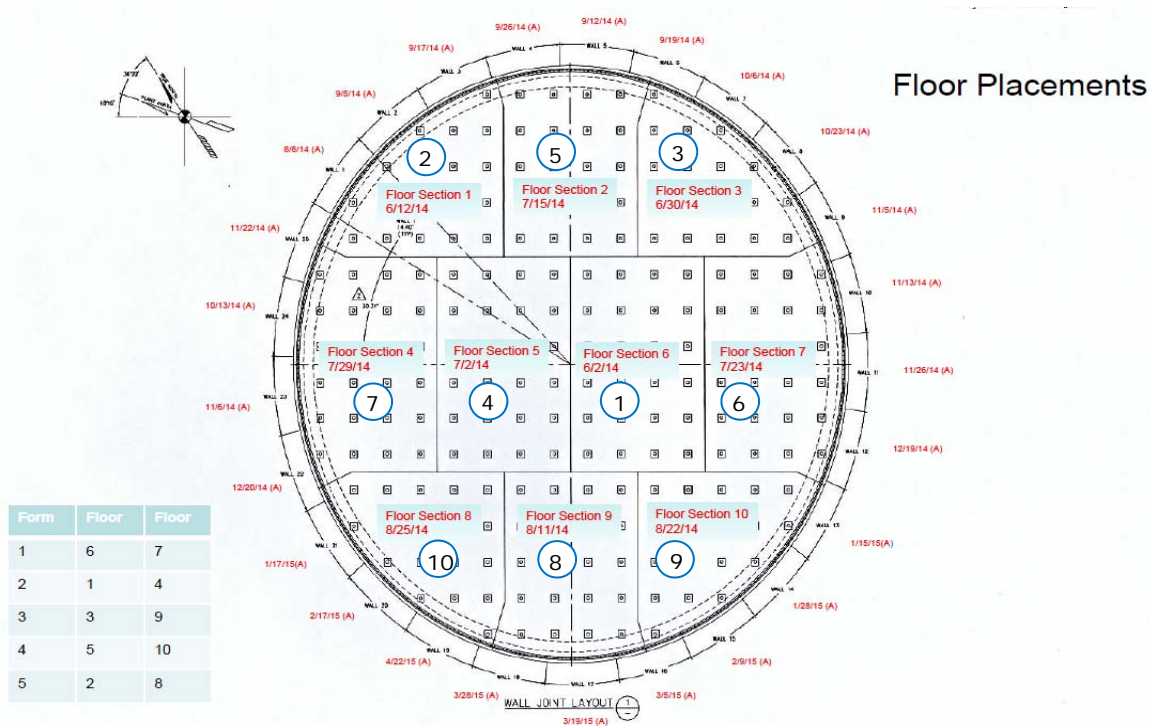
SDU-6 floor sections, showing the “checkerboard” placement order that likely restrained shrinkage and enabled concrete shrinkage cracking.
